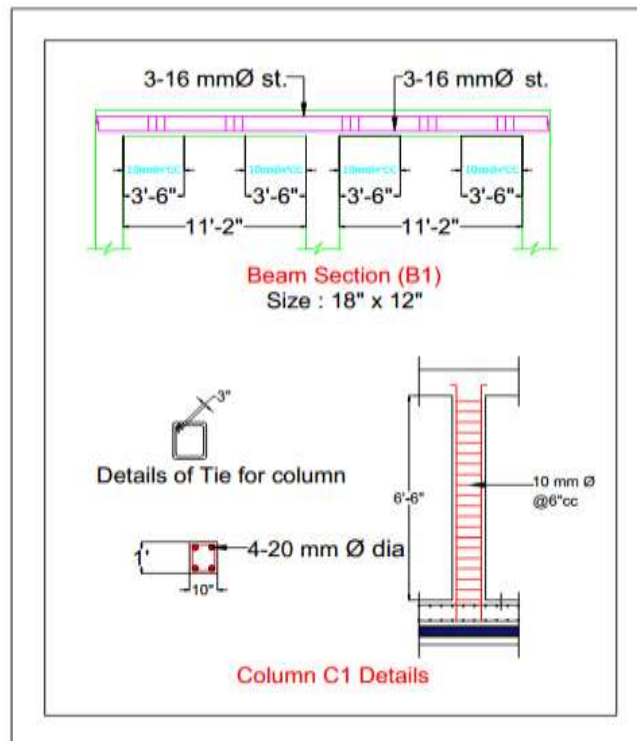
Beam and column sections for very large Institution-scale tank for 100 households
